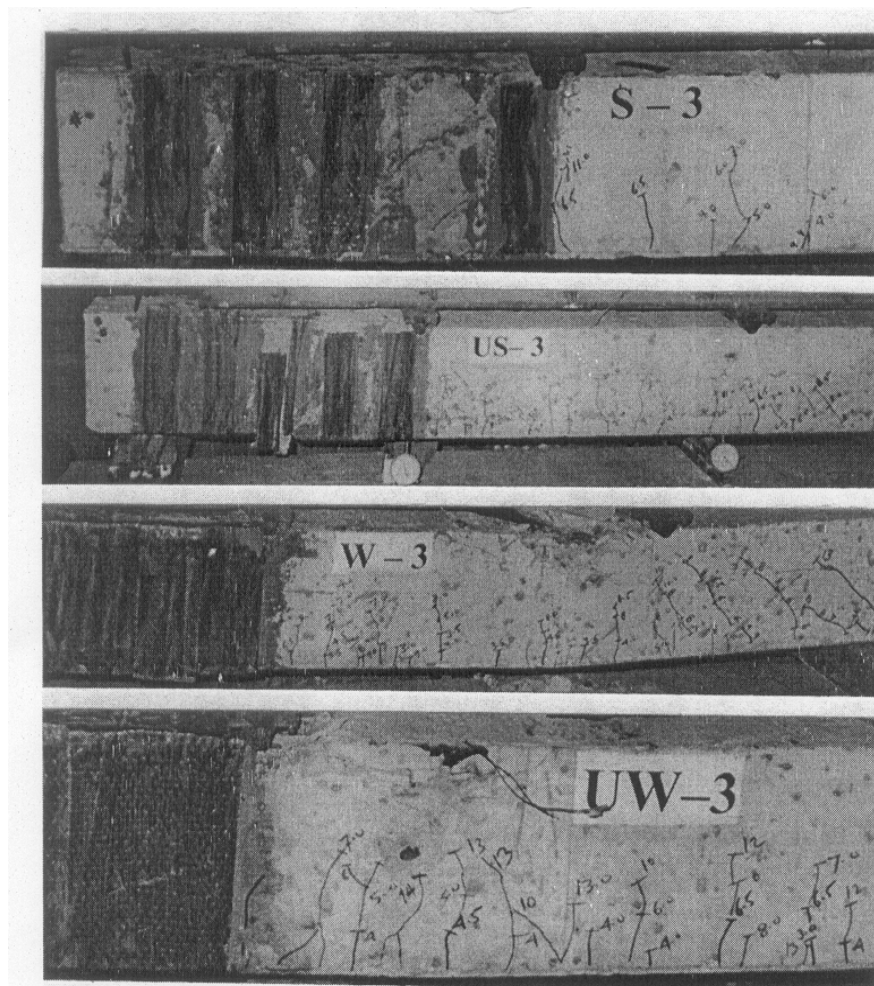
Cracking patterns for some of the retrofitted beams group (I).
